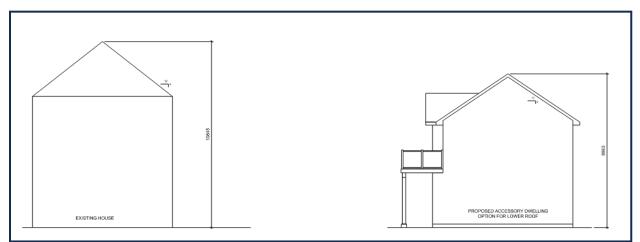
Conceptual Elevations of the detached accessory building and existing single-detached dwelling Source: Jay Stover
